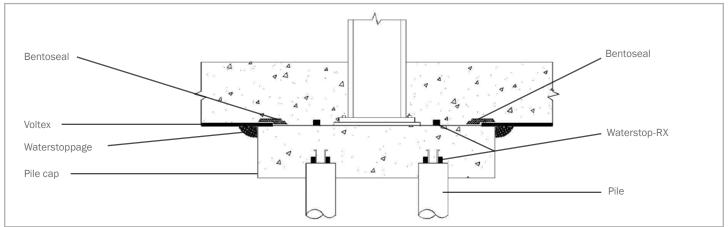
Pile Cap Detail (Non-hydrostatic condition).
